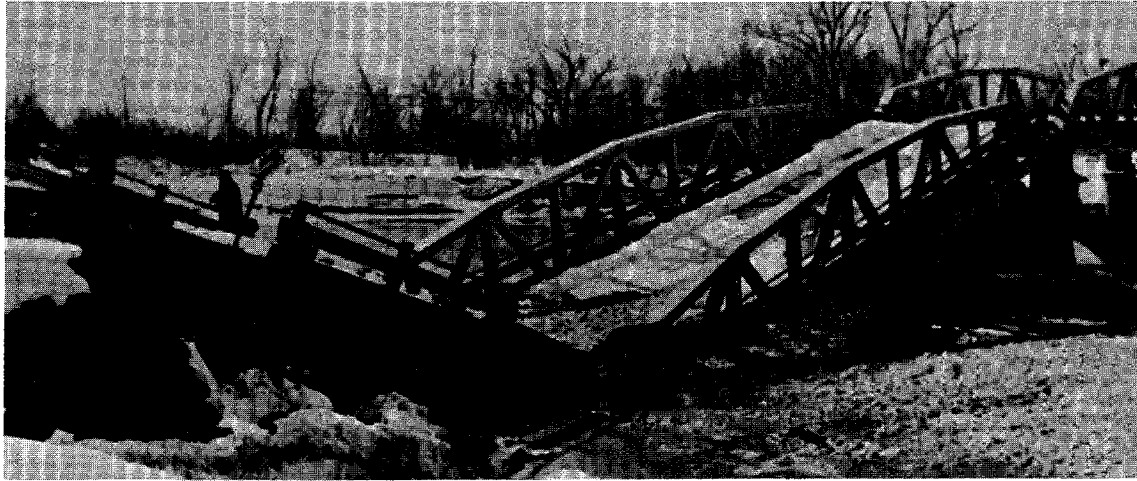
View of left end of failed bridge. (Nebraska Dept. of Roads photograph.)
